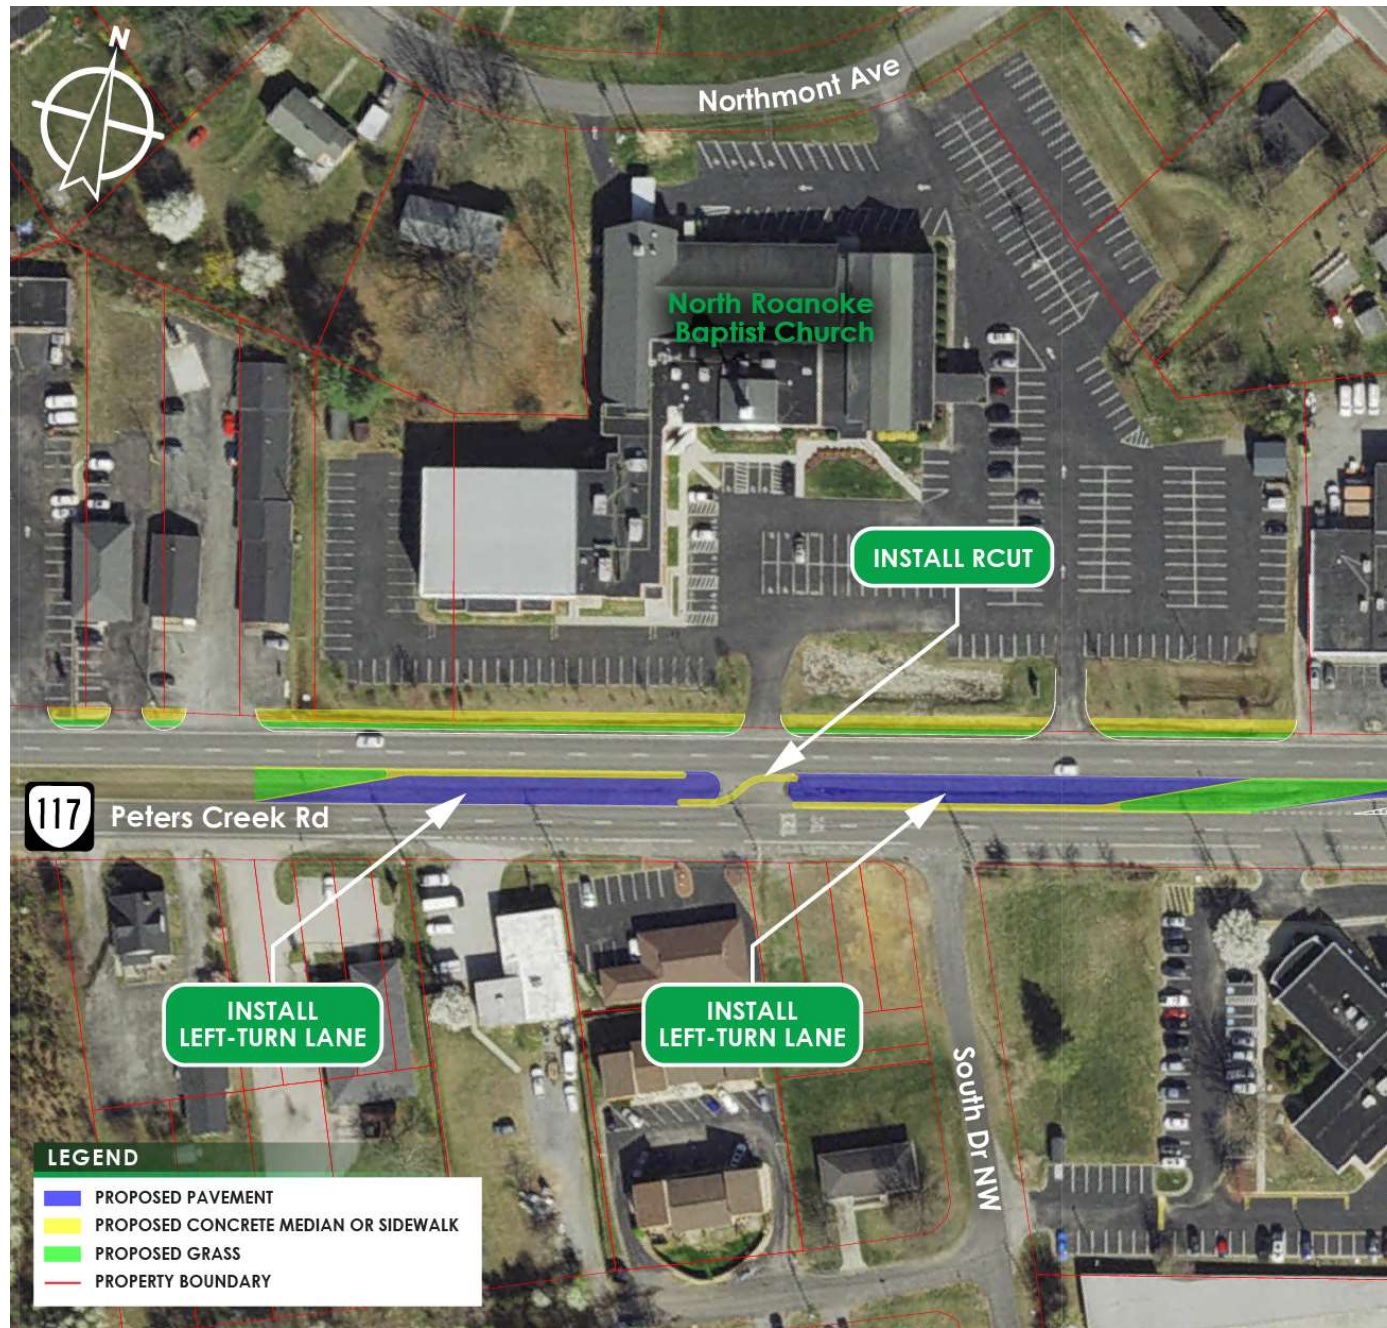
Peters Creek Road at North Roanoke Baptist Church
